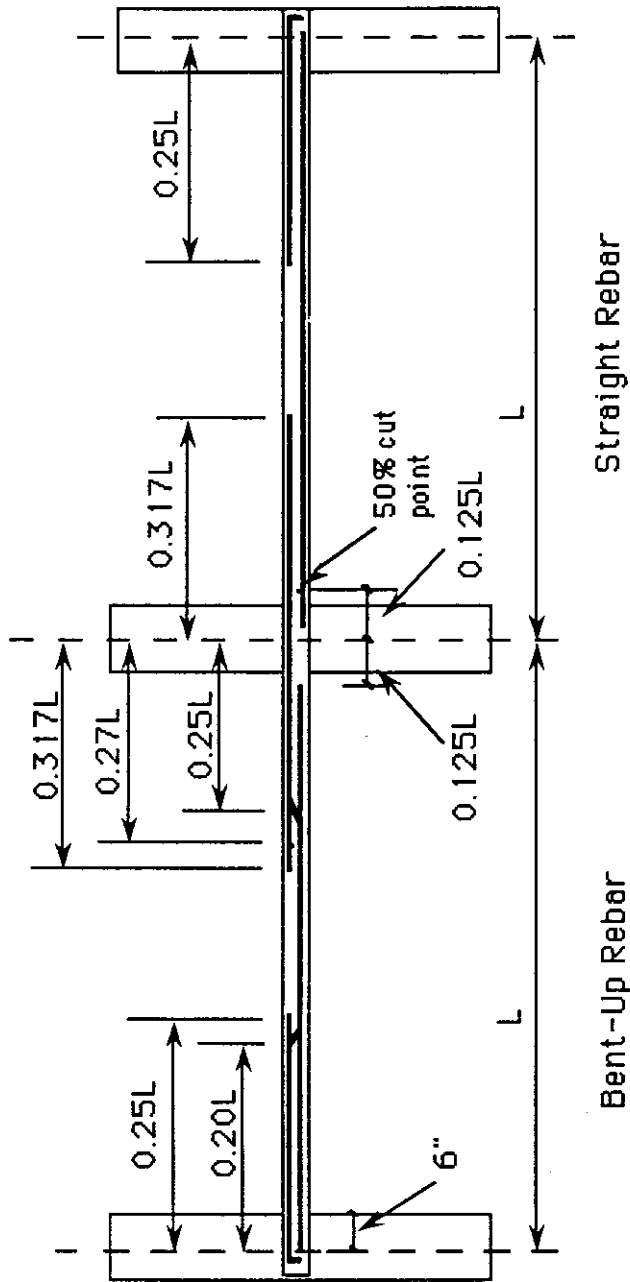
Straight and Bent-up Reinforcing Detail
